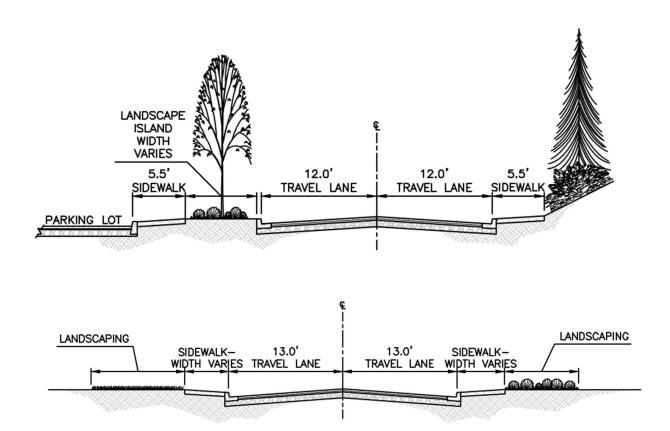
Conceptual Cross-Sections east of the East Parking Garage (top) and west of proposed West Pavilion (bottom)
